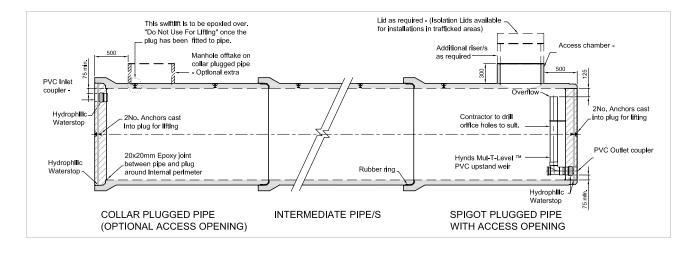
General layout of typical RJ type retention tank with Mul-T-Level™ outlet
